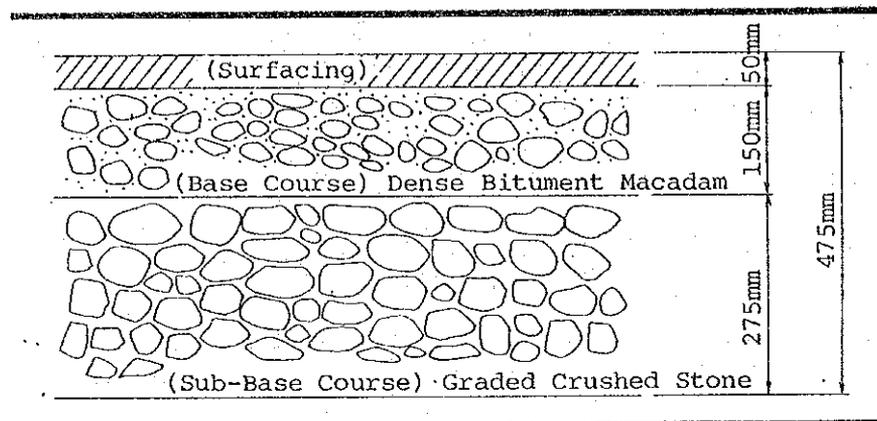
MEASUREMENT OF PAVEMENT STRUCTURE
